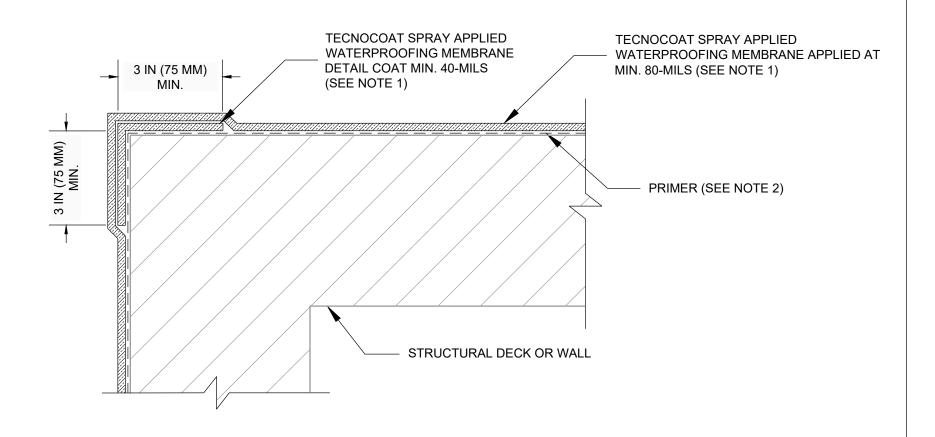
DETAILS ARE INTENDED TO BE A GUIDE FOR WATERPROOFING INSTALLATION ONLY
